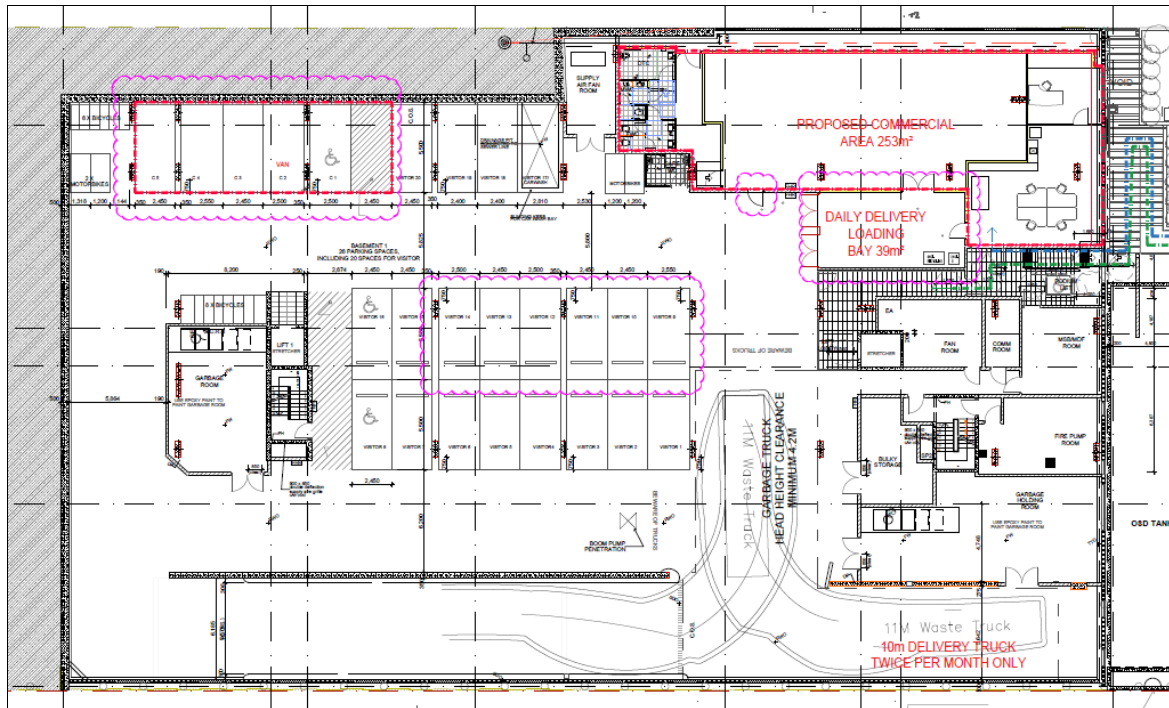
An extract of the proposed site plan, which shows both the proposed development and allocated car parking in relation to the site. Note: Pink shading within the centre of the extract denotes where allocated parking was originally to be situated utilising visitor parking; amendments have relocated such parking to the top left additional residential spaces of the site (denoted by the red dashed line and pink shading).
